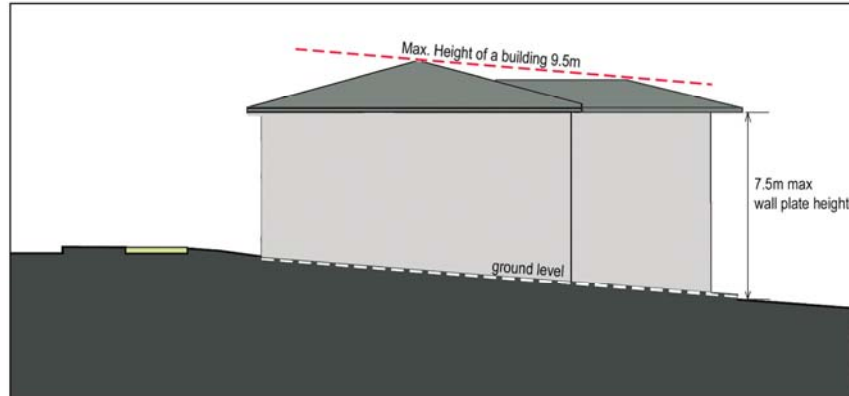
The building height is measured from the existing ground level to the topmost part of the building. The wall plate height is measured to the underside of the eaves. In this diagram the existing ground level and the finished ground level are the same.
